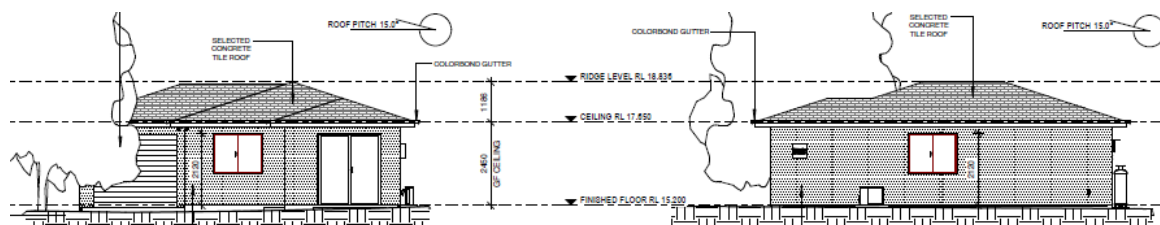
Eastern (front) and Northern (side) elevation (source - RESCON Builders)
